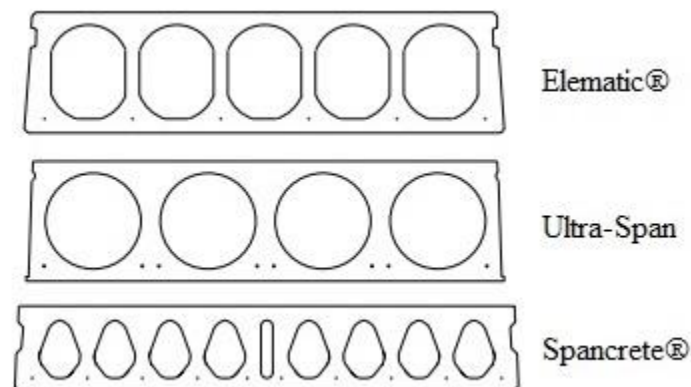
Typical HCS Cross-Sections, Buettner and Becker (1998)
